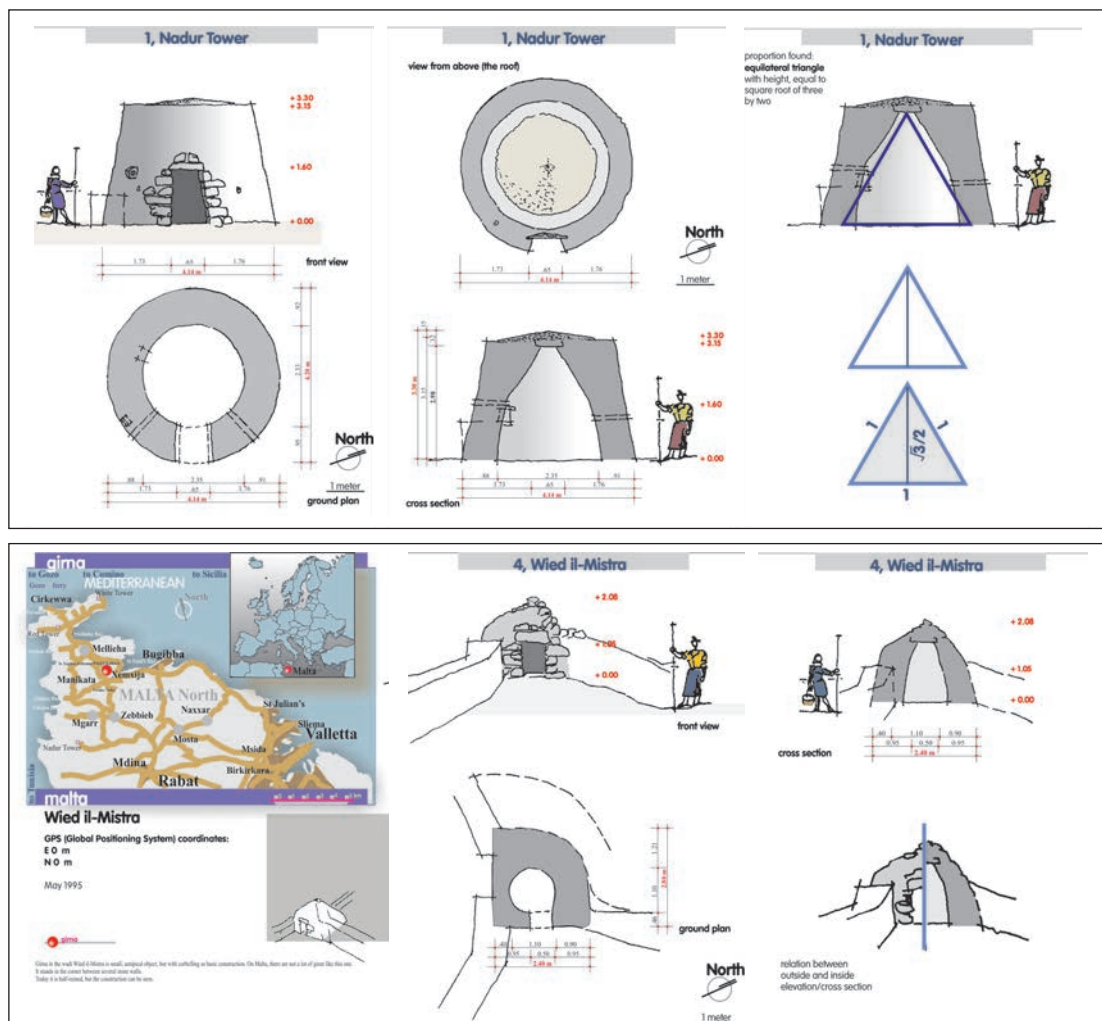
A/ 1 Nadur Tower. The typical truncated cone with a height of 3.30 m stands alone on karstic terrain. An extremely good construction in half hewn stone. Near the entrance can be seen the sling for a donkey. a/ elevation and groundplan, b/ view from above and cross section, c/ proportion found: square root of three, divided by two in an equilateral triangle, 1995. B/ Wied il-Mistra. Irregular shape of the girna in the corner of the yard. a/ first page with basic data and map, GPS data, b/elevation and groundplan, c/ cross section and elevation-cross section, 1995.
